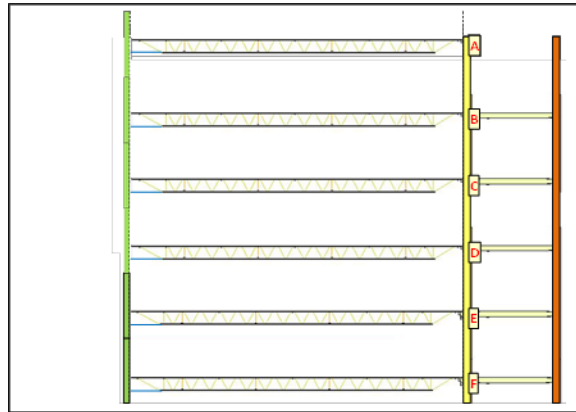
Structure showing floor trusses on six floors – from the perimeter columns to an interior core column.
